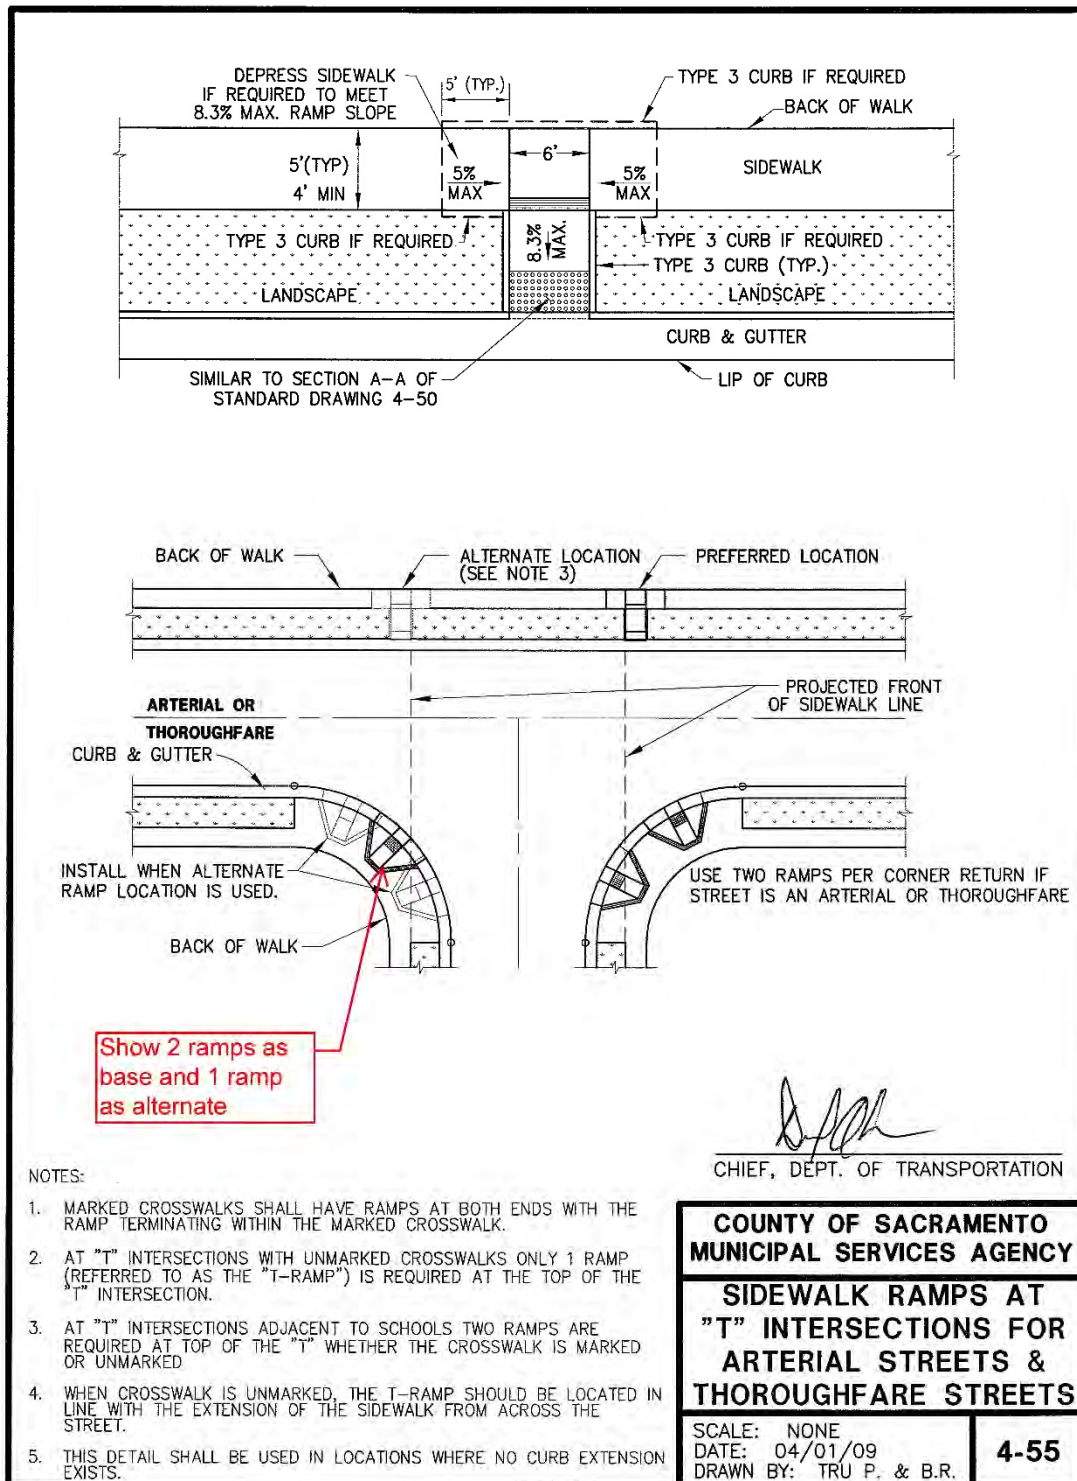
Standard Drawing Markup – Sidewalk Ramps at "T" Intersections for Arterial & Thoroughfare Streets
